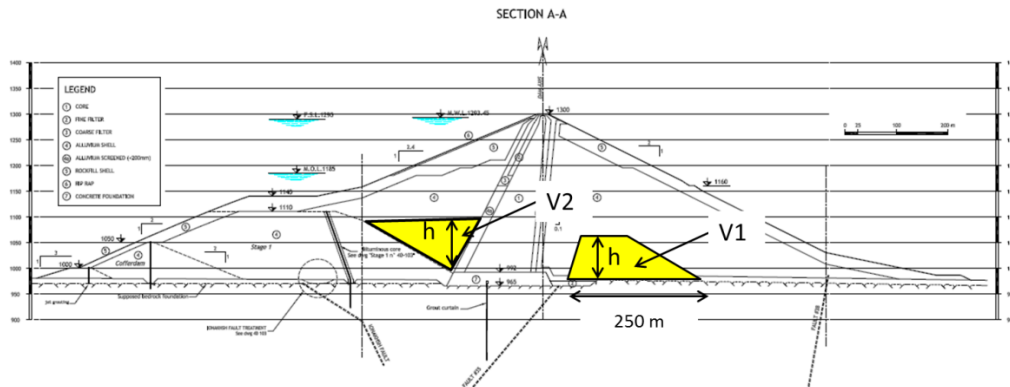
Longitudinal section. Alternative 1290 m asl.
